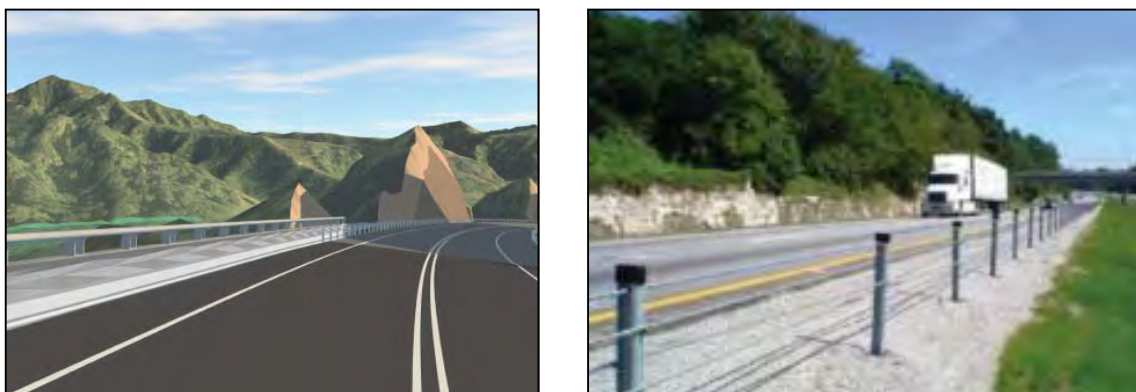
Typical Barrier details (rigid and wire rope)
